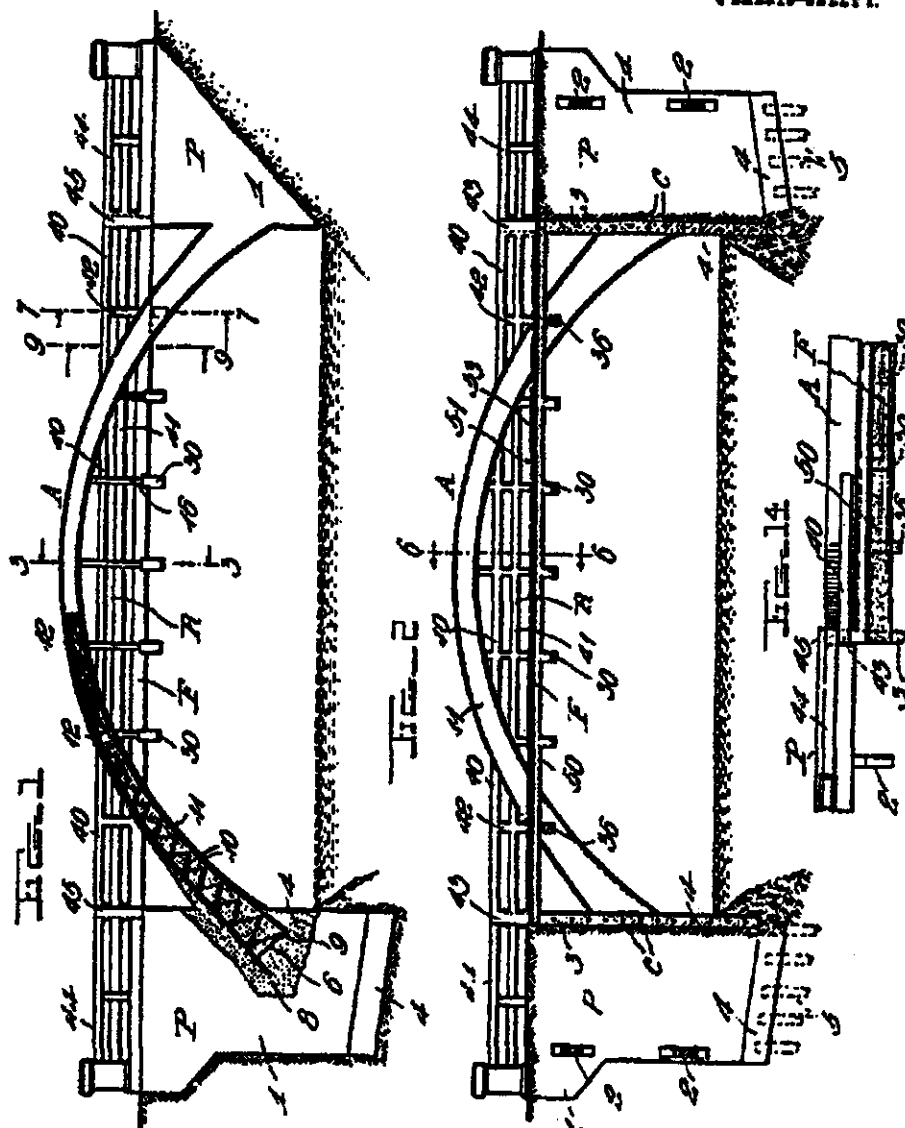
Luten's 1902 tied arch uses a reinforced concrete tie.
